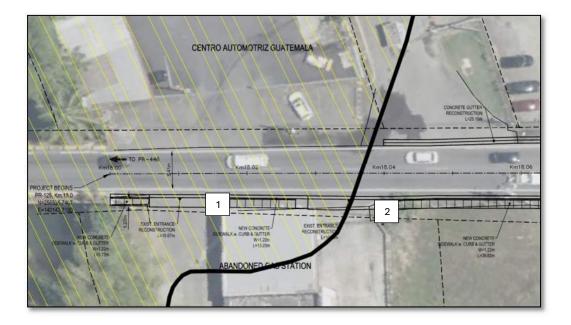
Design for proposed activities at the beginning of the project and photos key plan
